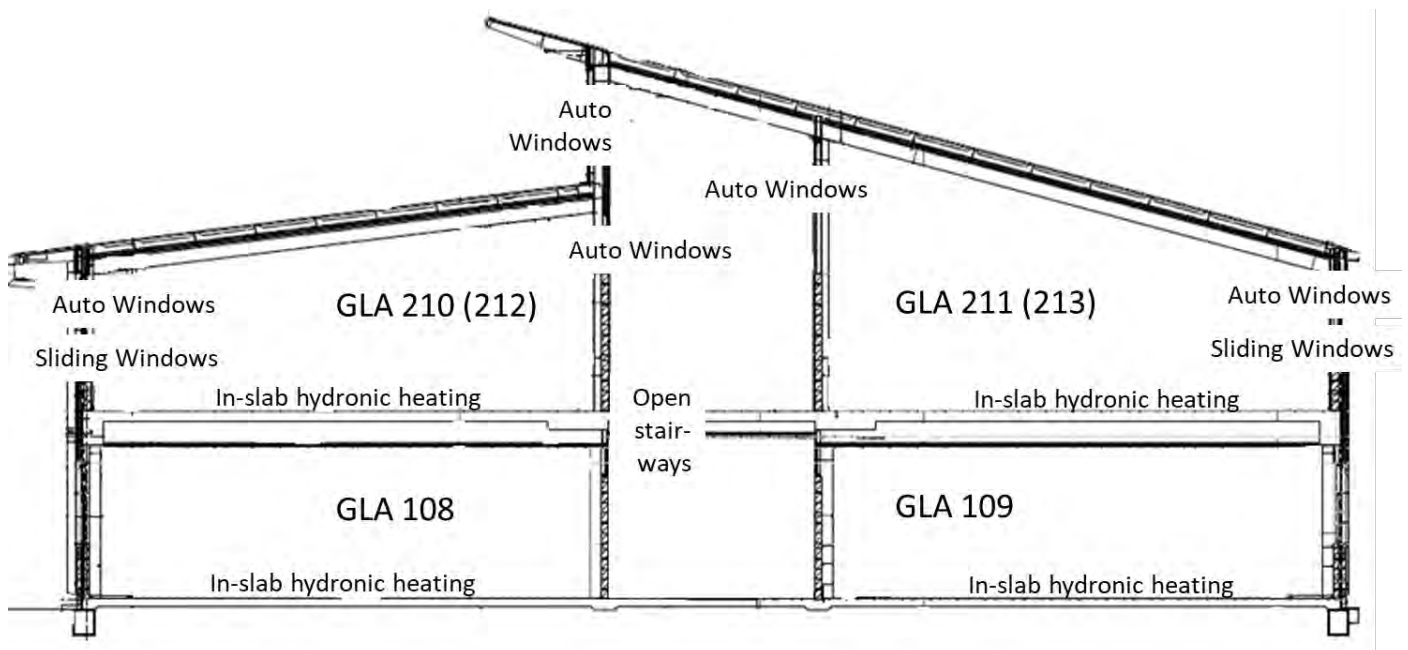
Section view from the west (north to the left) showing solar passive design elements.
